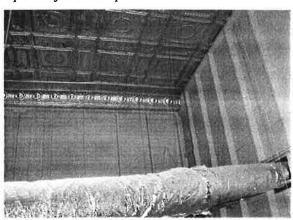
At some point, possibly as late as the 1940s, the courtroom was remodeled and the western twenty feet walled off for use as office space. The wall was built with studs and planks. The rough structure is fully painted which suggests that it was intended to be exposed on the office side.
